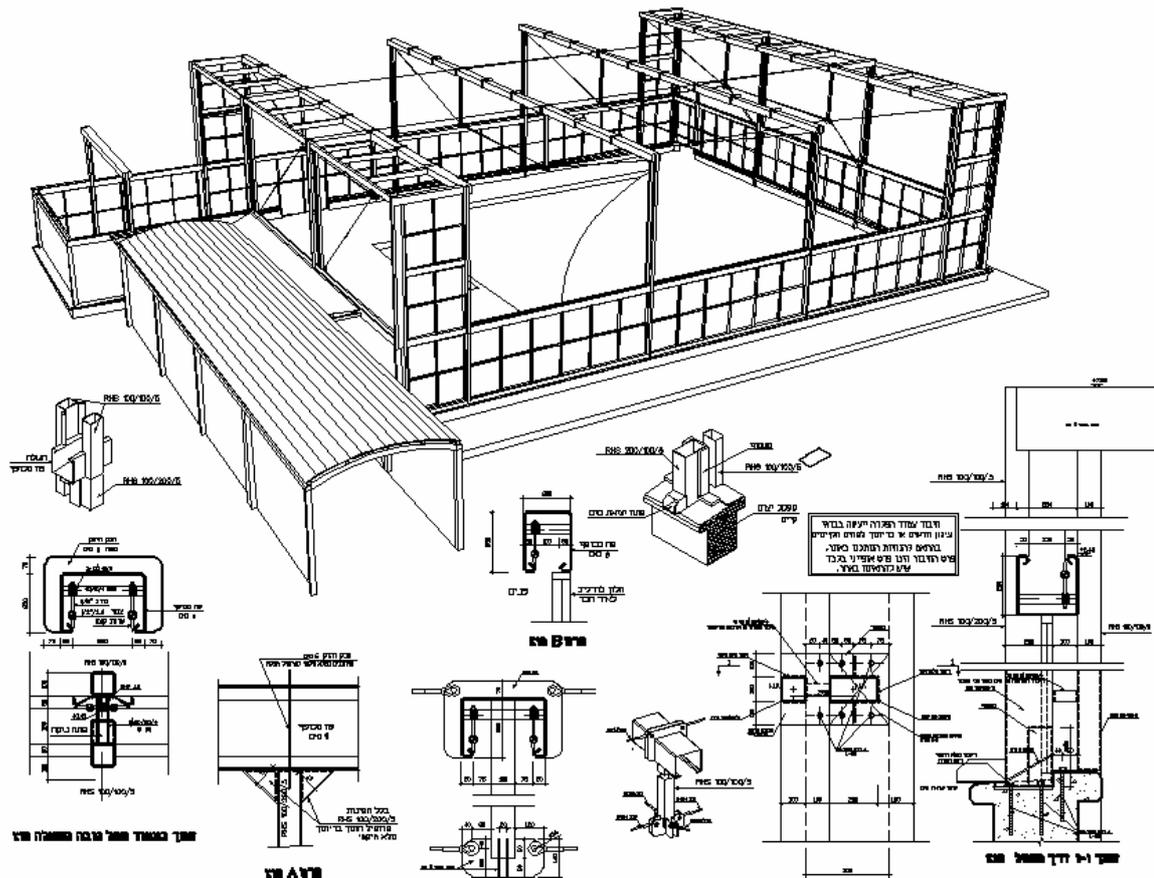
Amado Roof; View of the skeletal orthogonal structure and typical cross sections, tensioning devices and drainage solutions.
